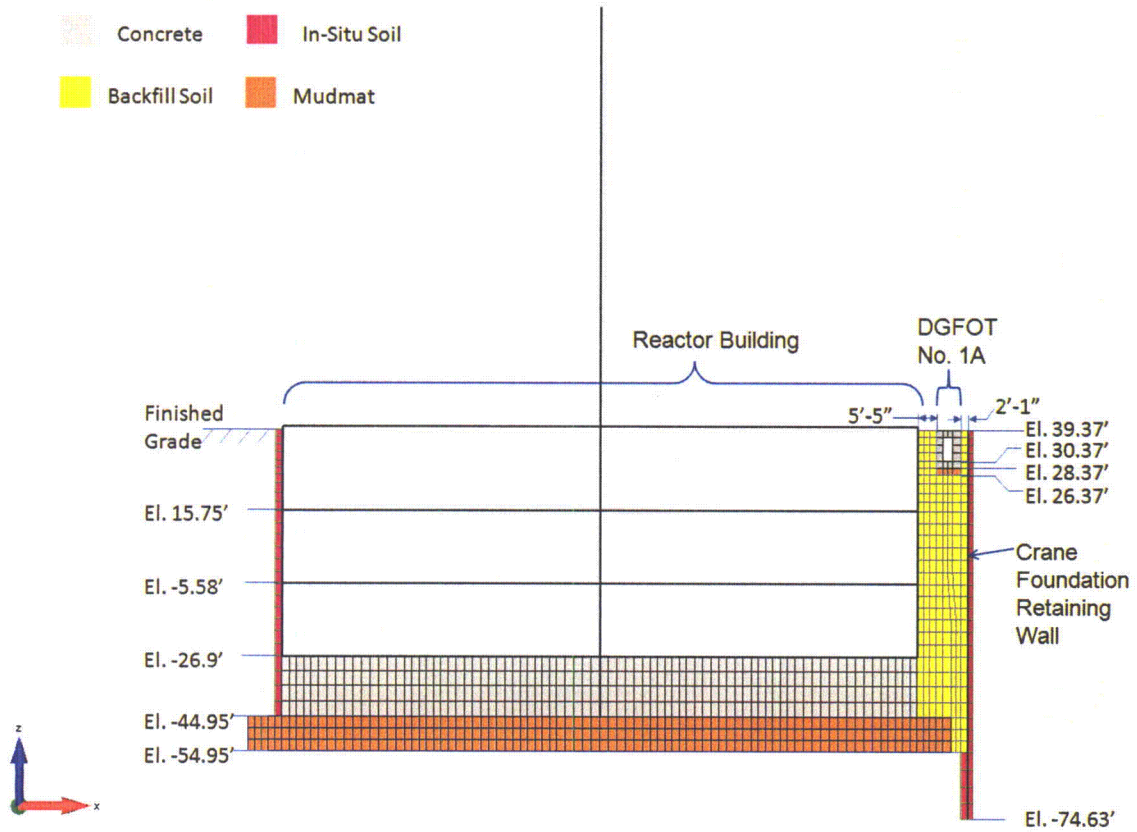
H.7-21: 2D SSSI Model of RB, DGFOT and Crane Foundation Retaining Wall
